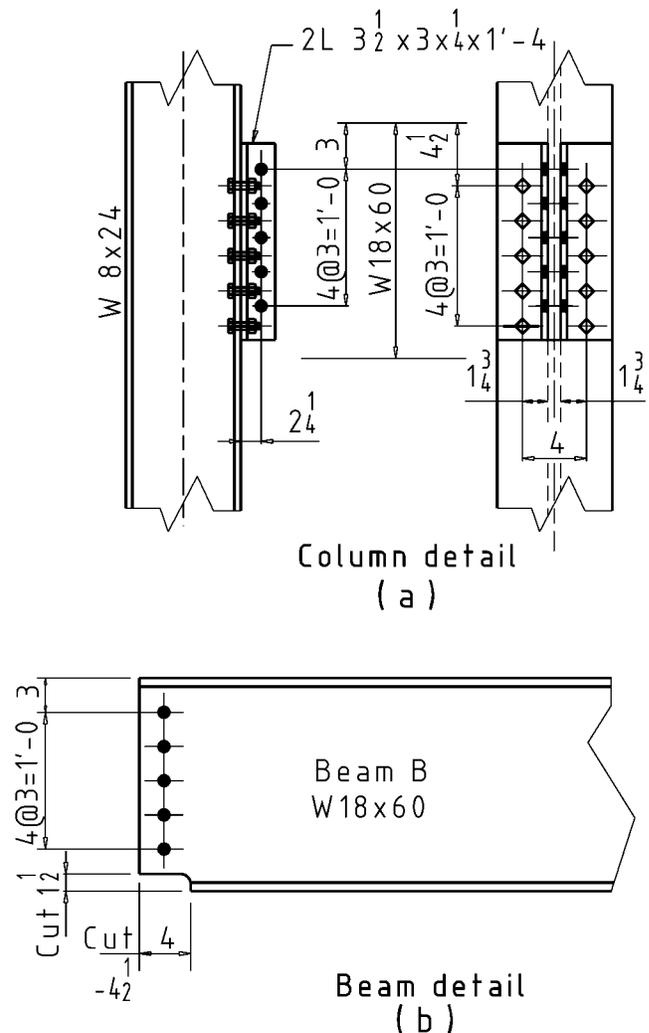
A pair of connection angles (or framing angles) shop bolted to the column flange.
